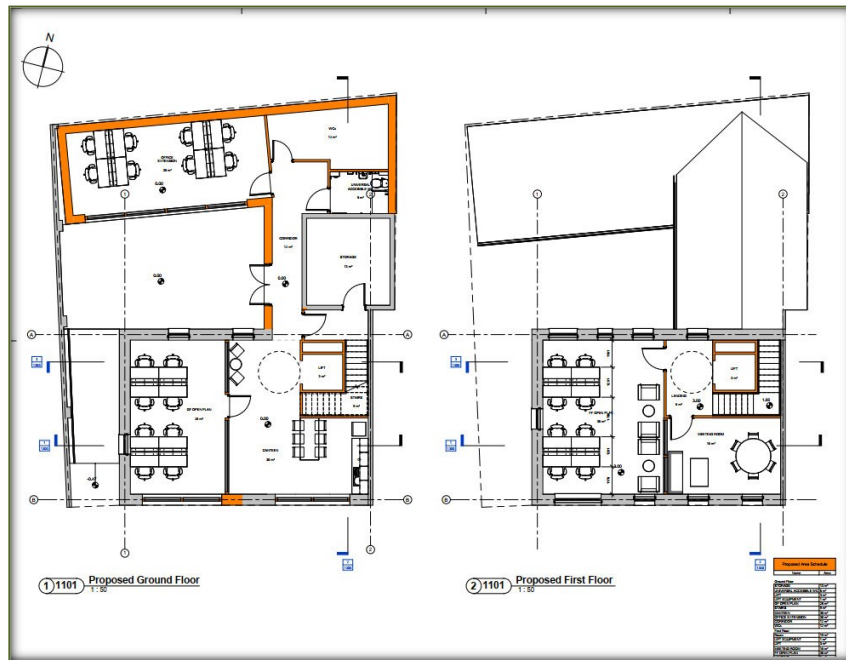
Proposed Floor Plans (as prepared by Kavanagh Tuite Architects)
